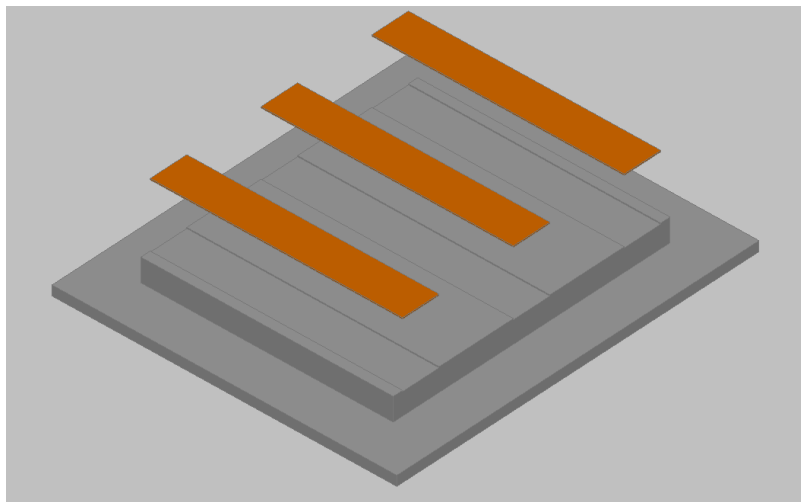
Chart. Three dimensional bottom view of the Assembly Design VII.
